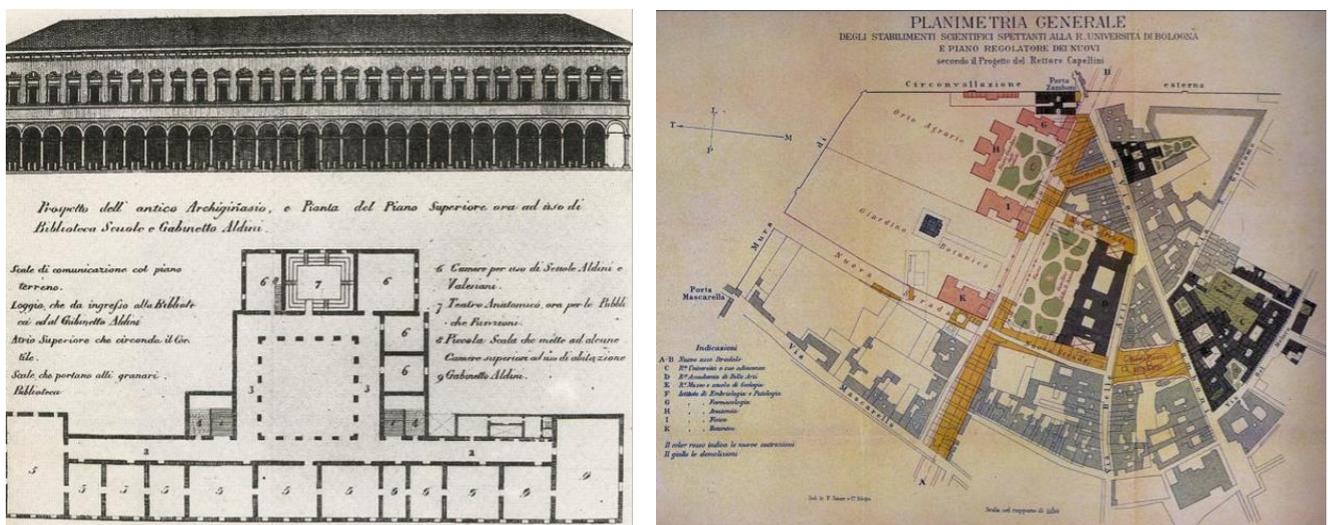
Plan and elevation of the Archiginnasio (left) and general planimetry (right)
